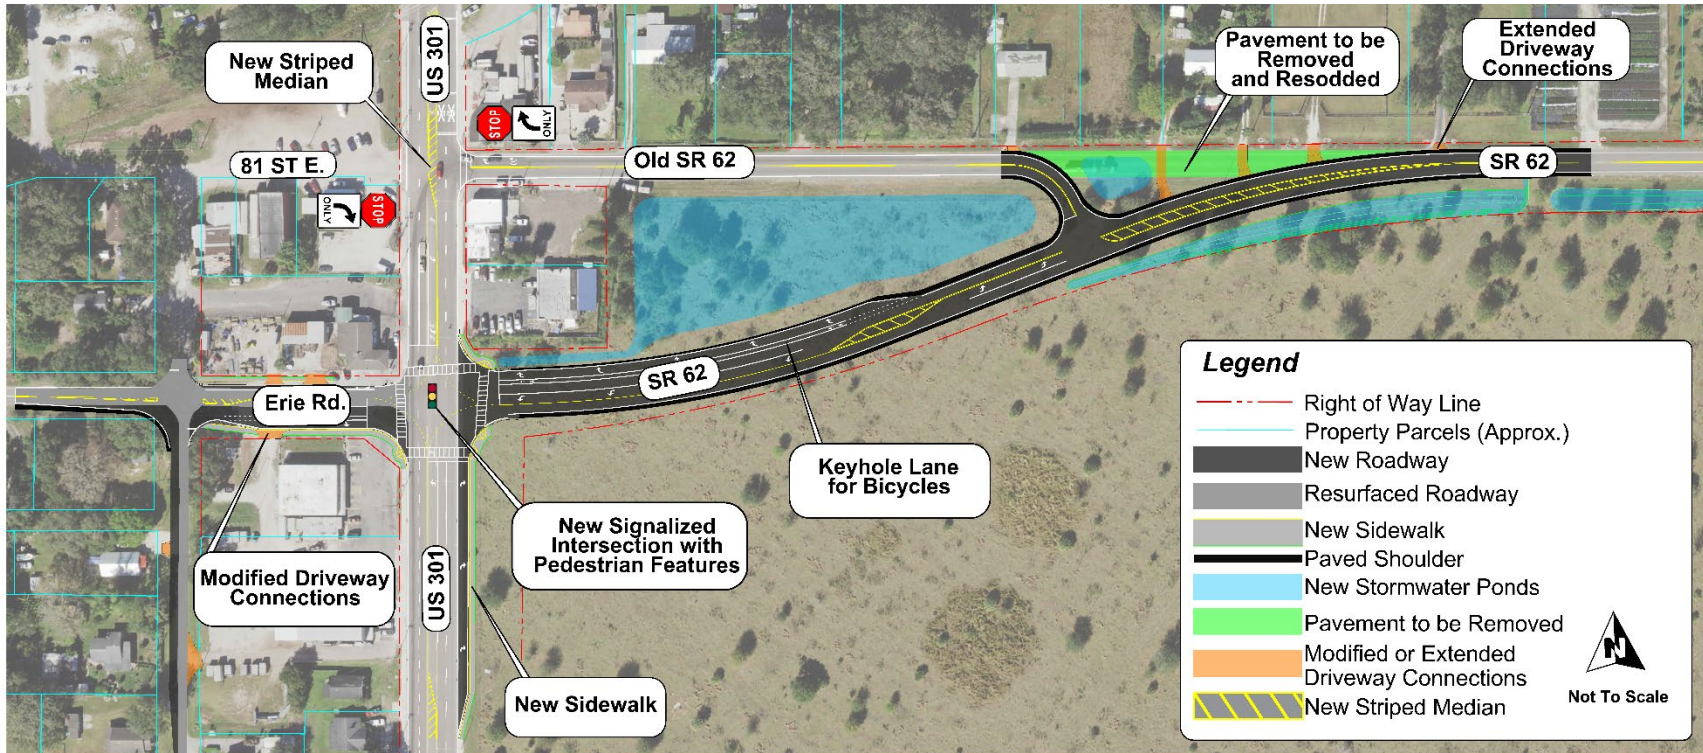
US 301 and SR 62/Erie Road Intersection Concept Layout
